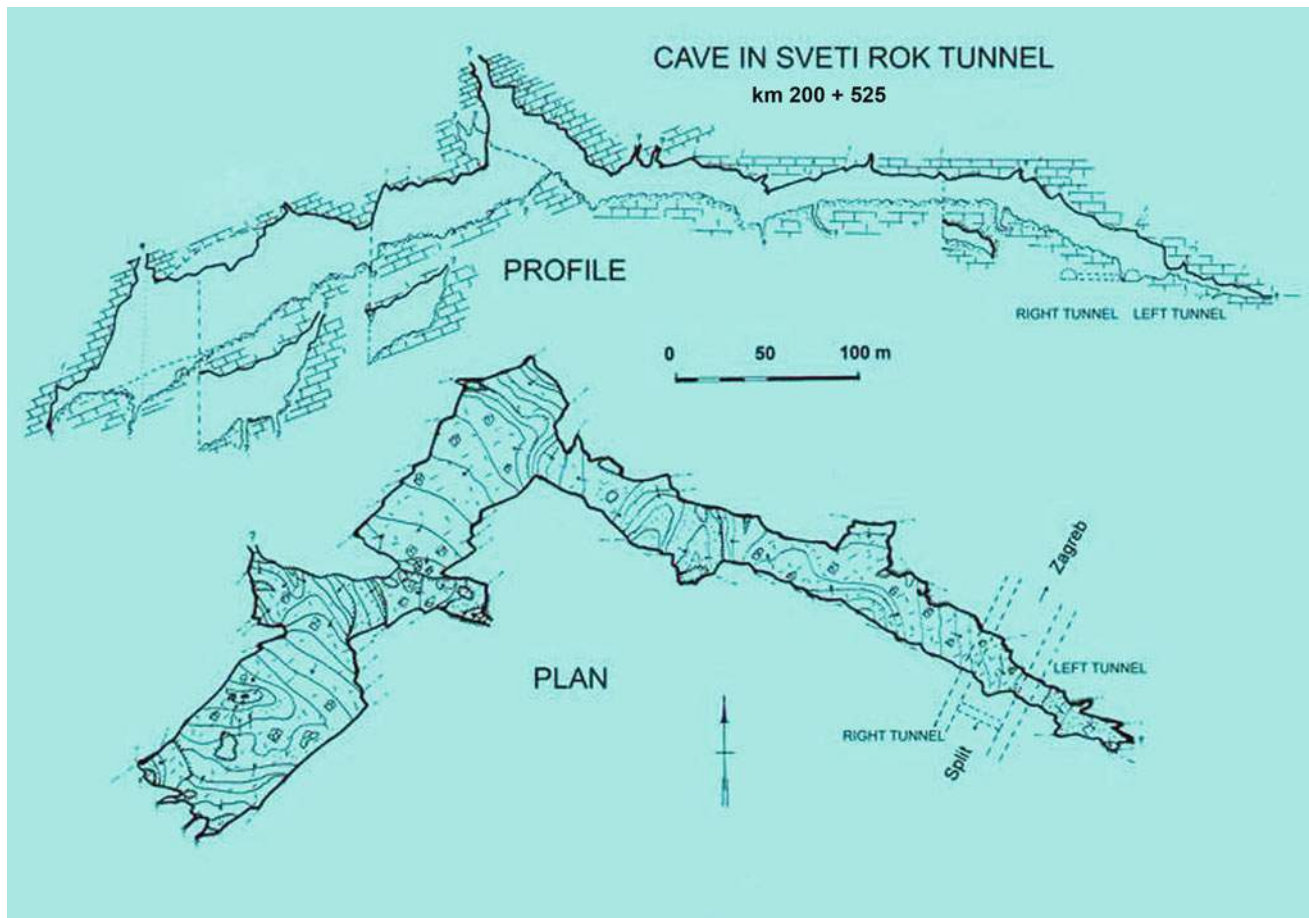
Profile and plan of cavern at km 200 + 525 in Sveti Rok Tunnel
